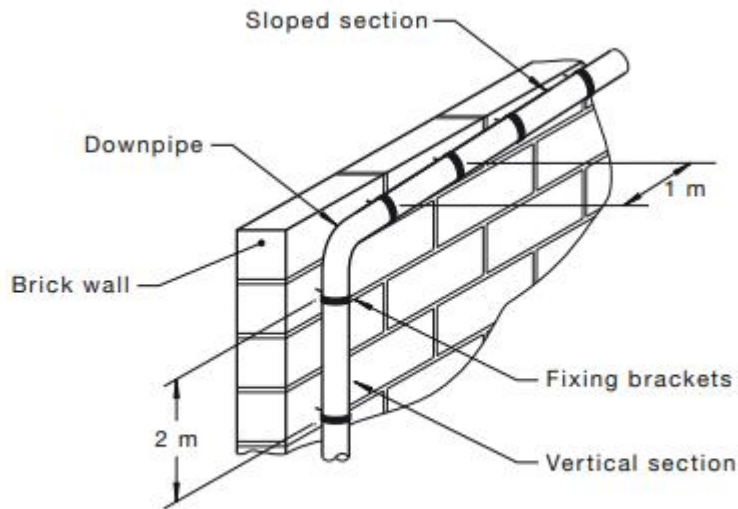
DOWNPIPE FASTENINGS
